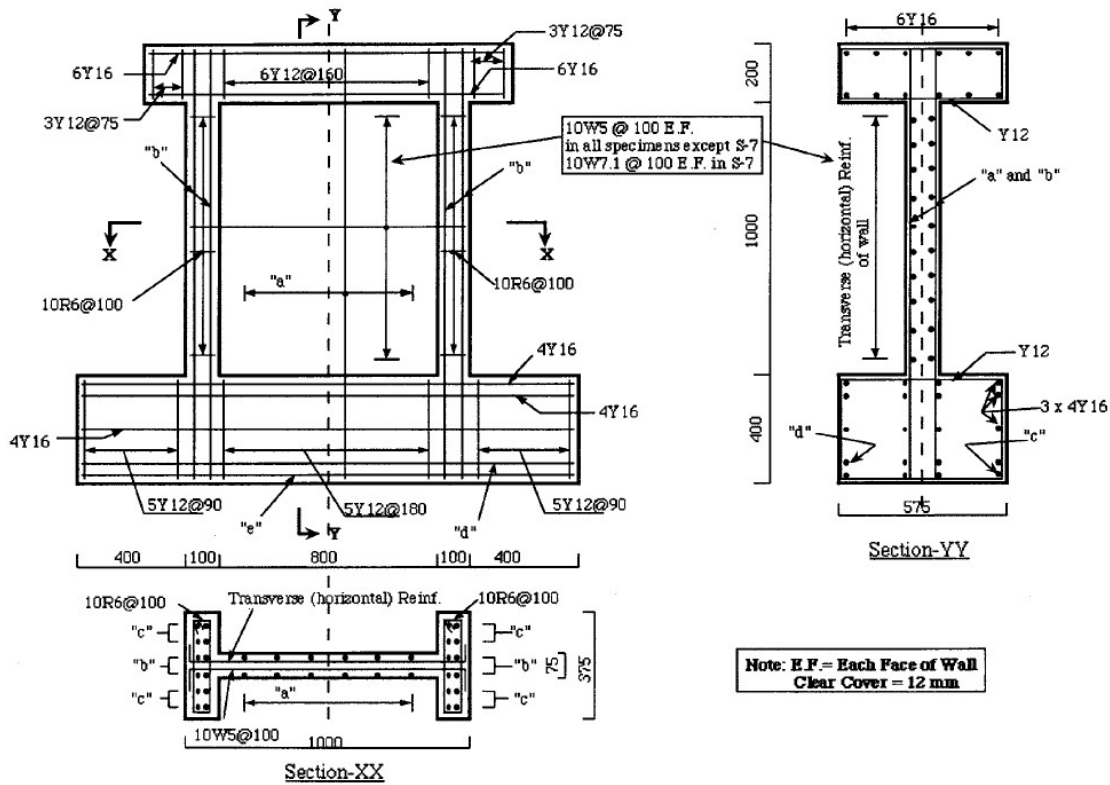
Typical details for walls tested by Gupta and Rangan (1998)
